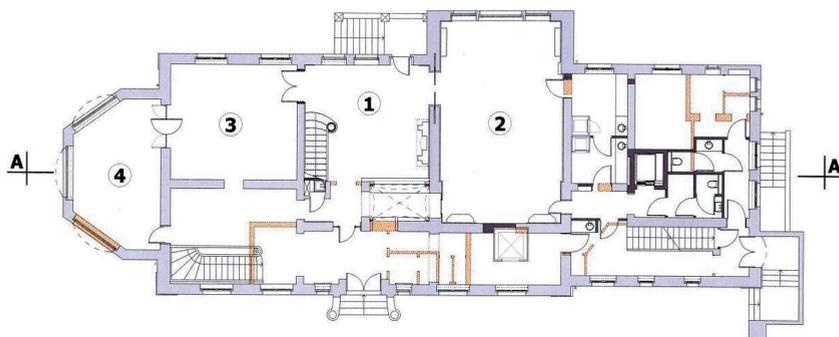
A ground floor plan: 1 – fireplace ballroom; 2, 4 – conference halls; 3 – secretary office. Existing walls and ceilings – grey; walls devoted for demolition – orange; new walls and ceilings – black
